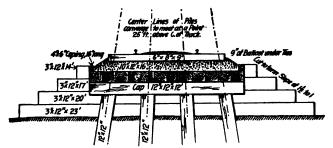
Bridge Floor of Old Rails; Chesapeake & Ohio Ry.
